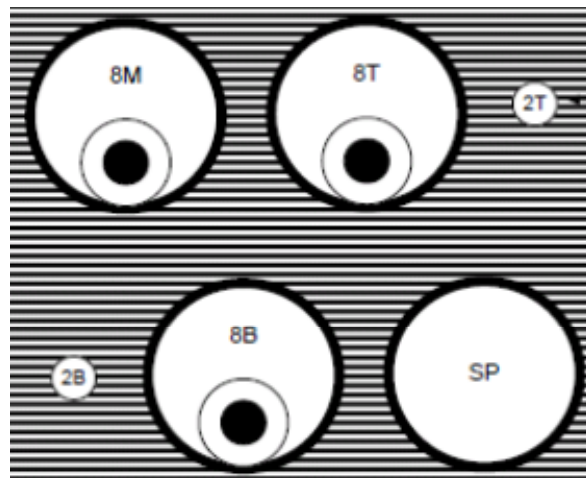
The Inverted-Delta Configuration of the Underground, 115-kV Conductors, Inside 7.27" ID, HDPE Pipes Having 0.639" Walls
